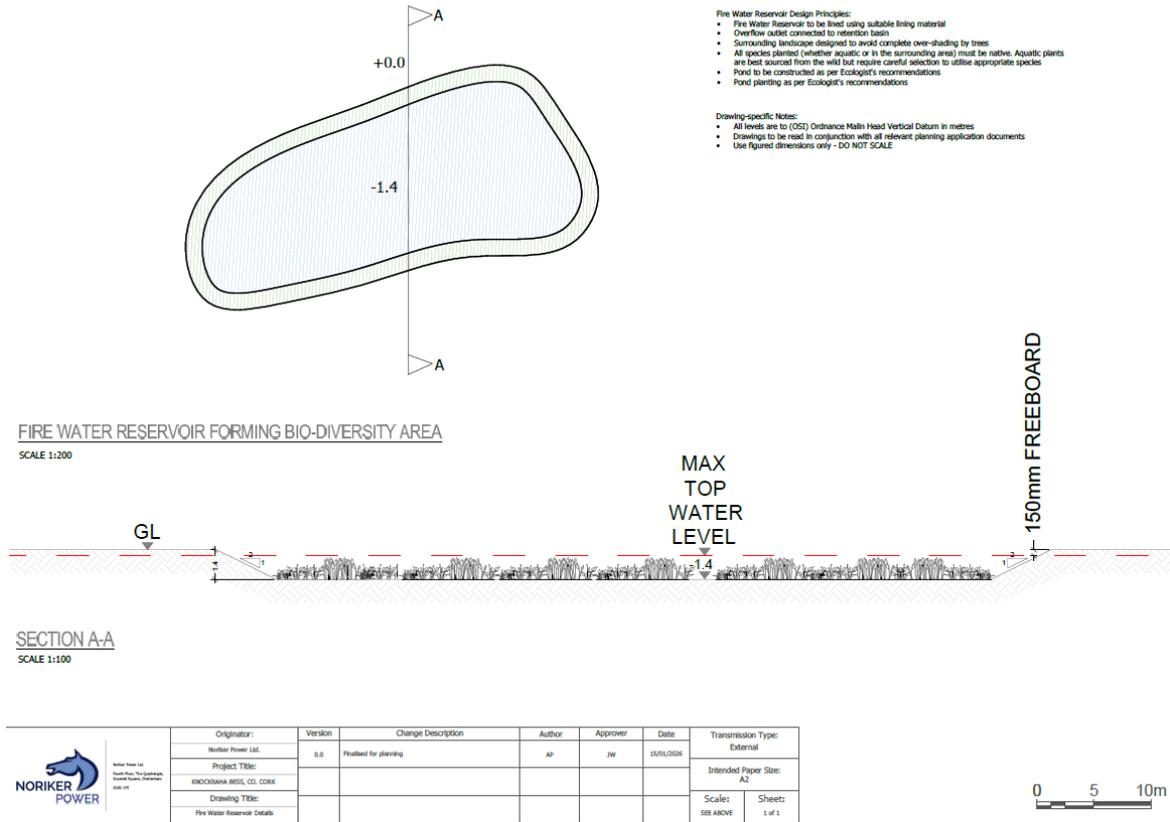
Typical Drainage and Fire Water Details (Drawing ref. no. 24045-151)
